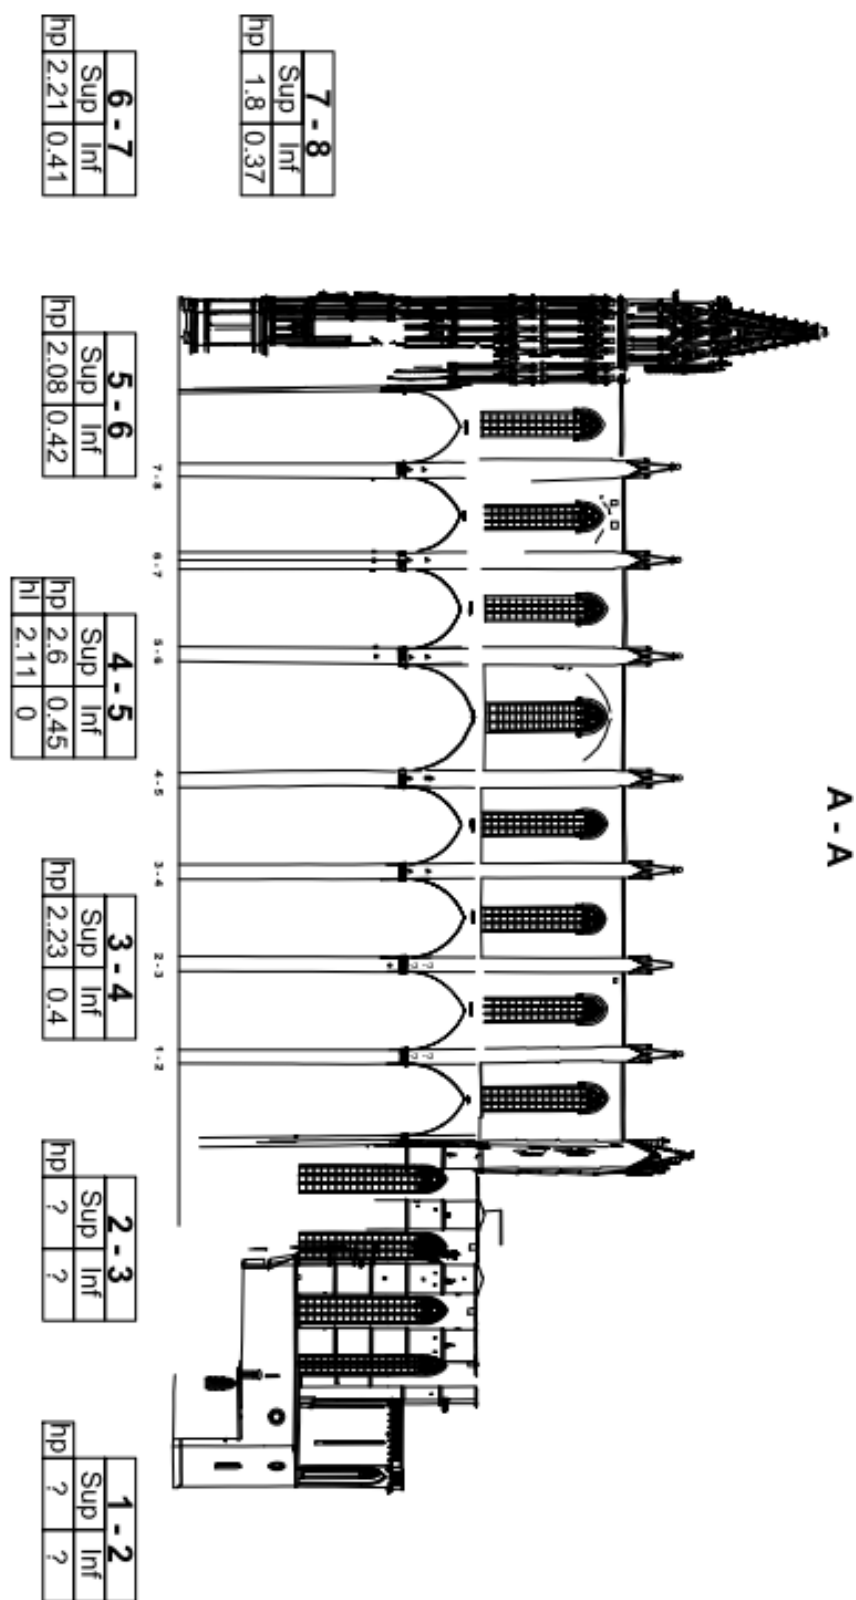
Cut A-A: South lateral nave, exterior elevation
